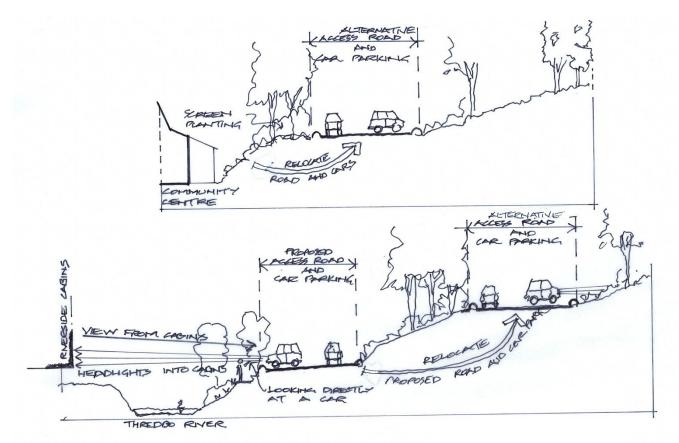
Site Sections Including Alternative Access Road and Car Parking Locations
